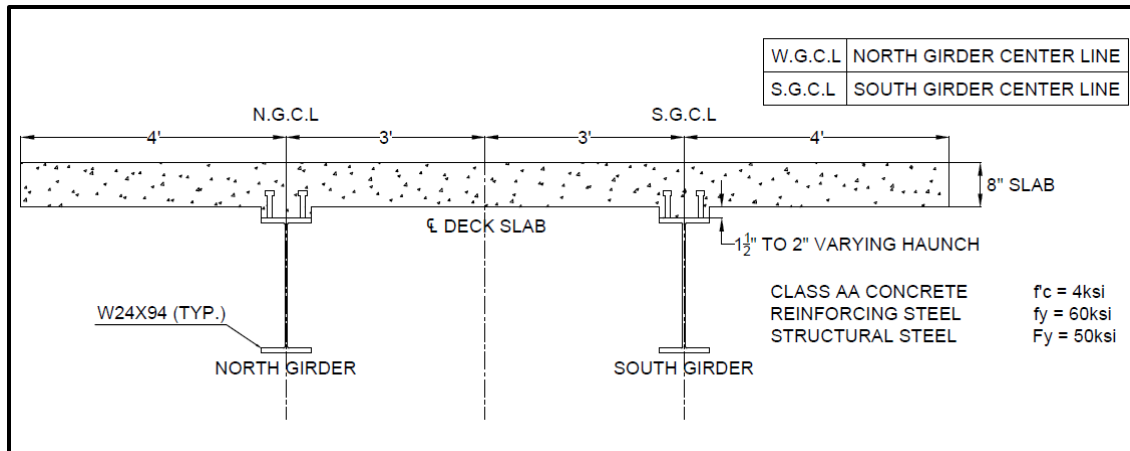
Cross section of composite bridge section from the full-sized prototype.
